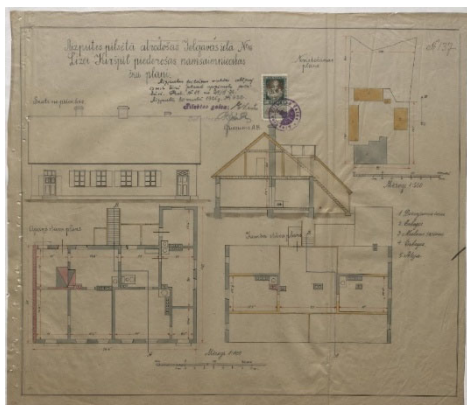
Plan and facade drawing of the household building made in 1926 confirming spatial layout of plans and facades at that time, and depicting the planned changes affecting the use of attic spaces. 1926 Archive material of the Aizpute Local History Museum.
